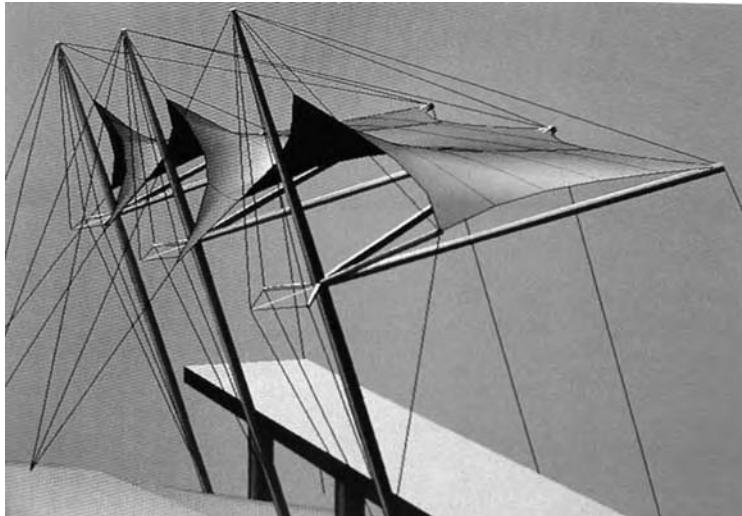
Most architectural structures still use steel cables, as in this picture.
